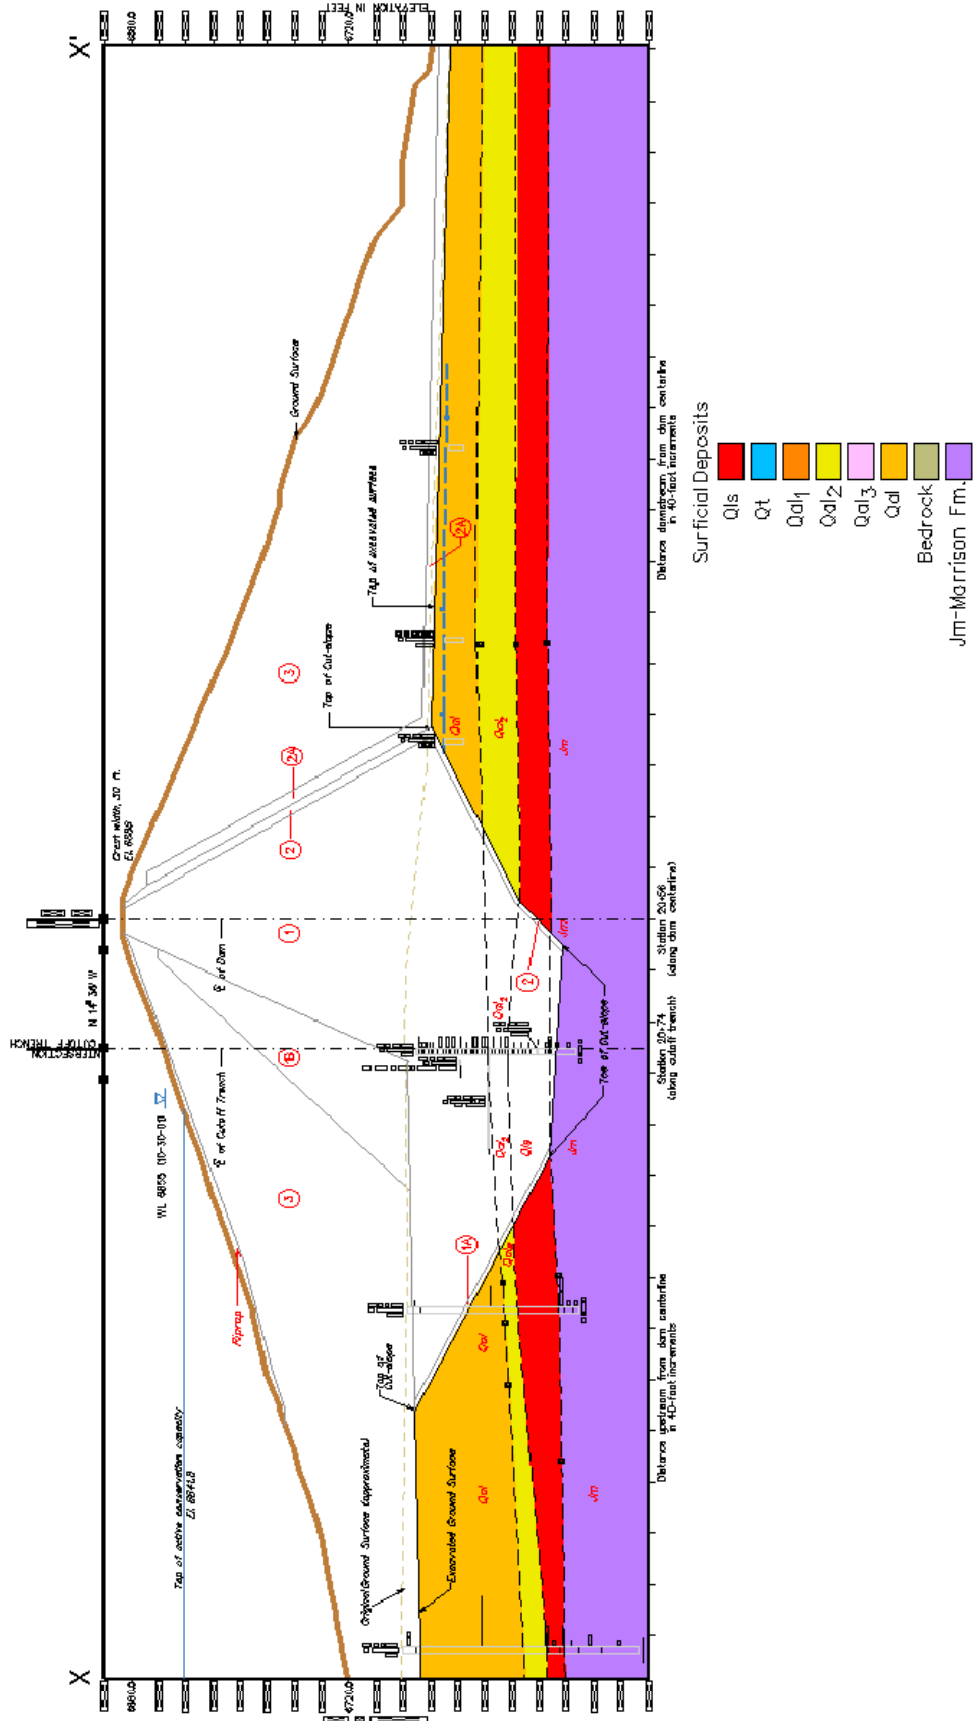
Geologic cross section along the maximum section of Ridgway Dam.
